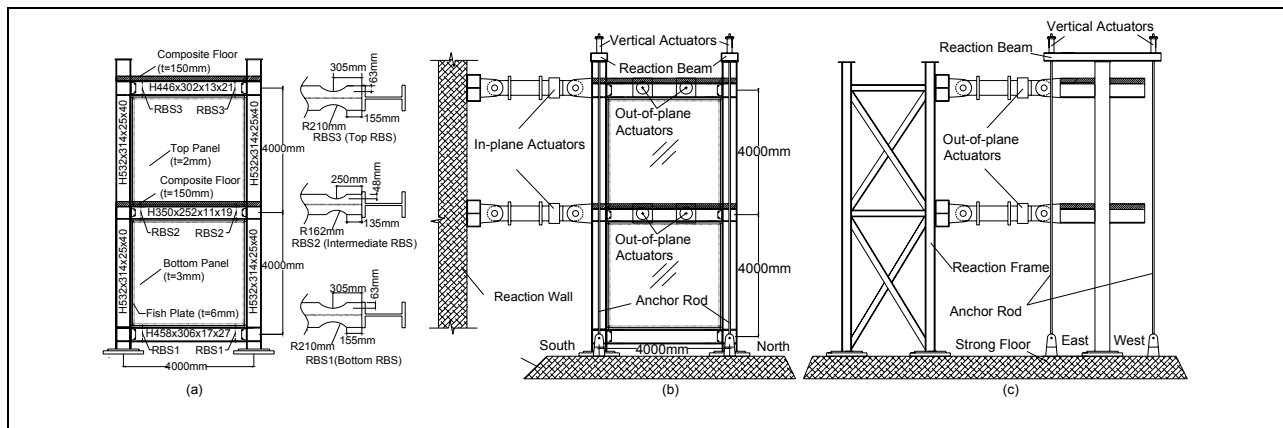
Specimen Schematic (a); In-plane Setup (b); Out-of-Plane Setup (c)
